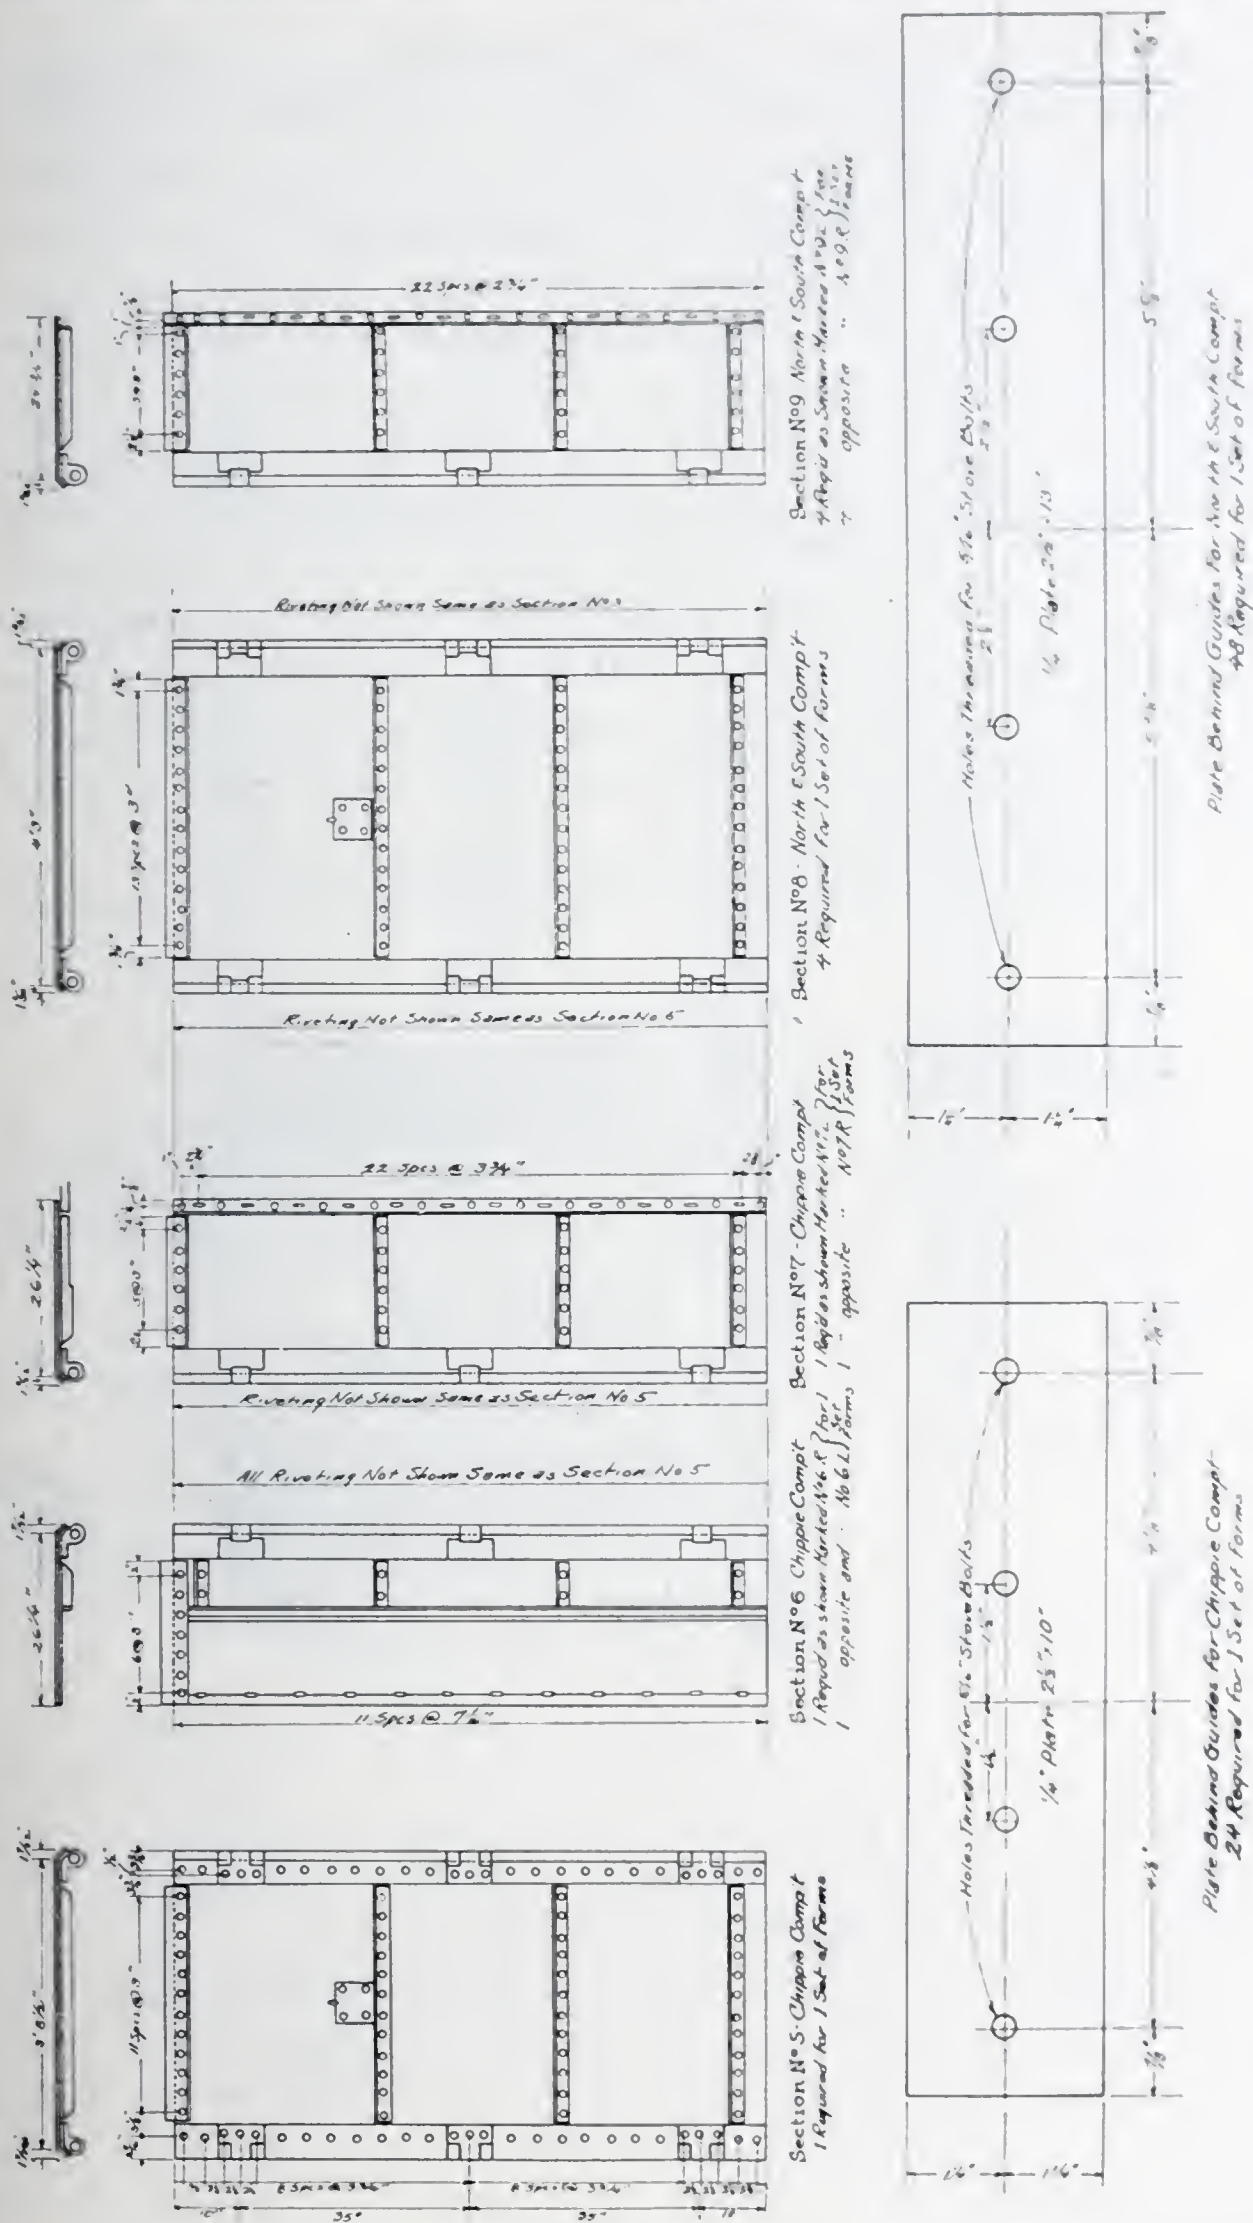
Detail of Steel Forms for Concrete Work in Granite Mountain Shaft.
